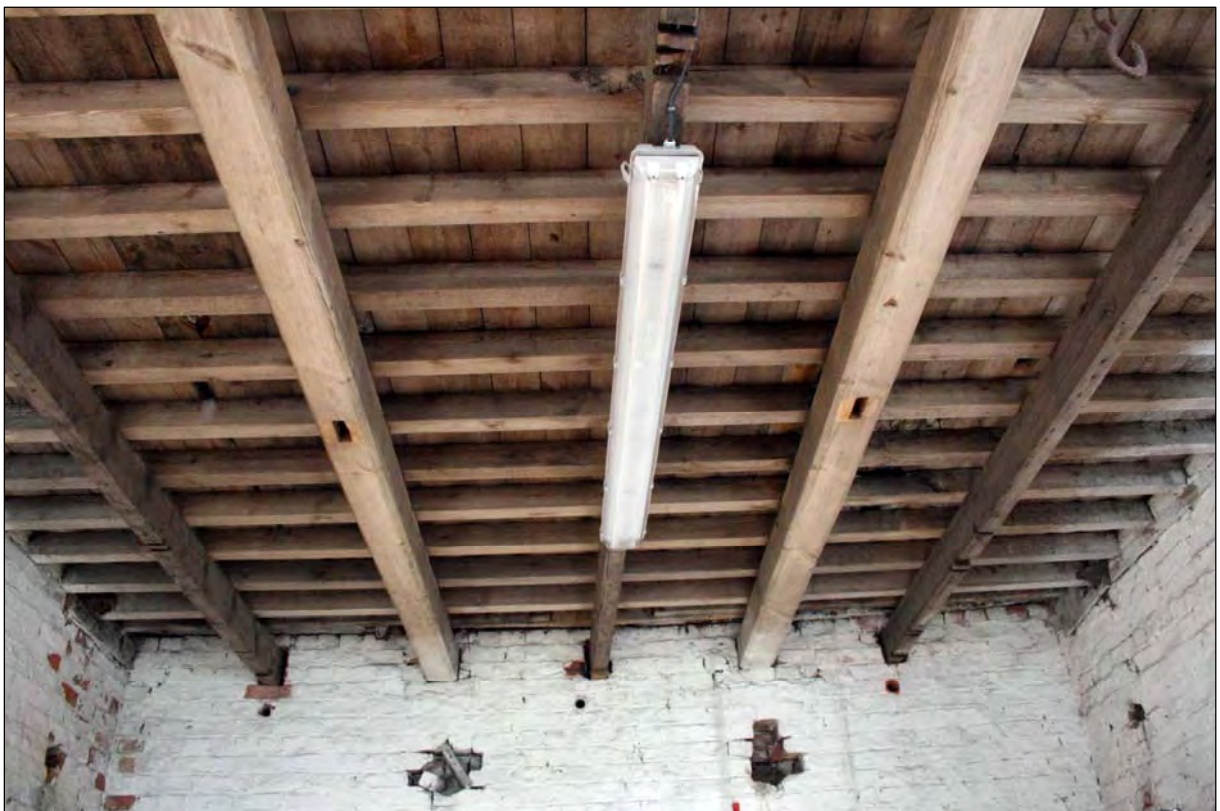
B1 interior ground floor rafter details looking NE (image no. 130).
